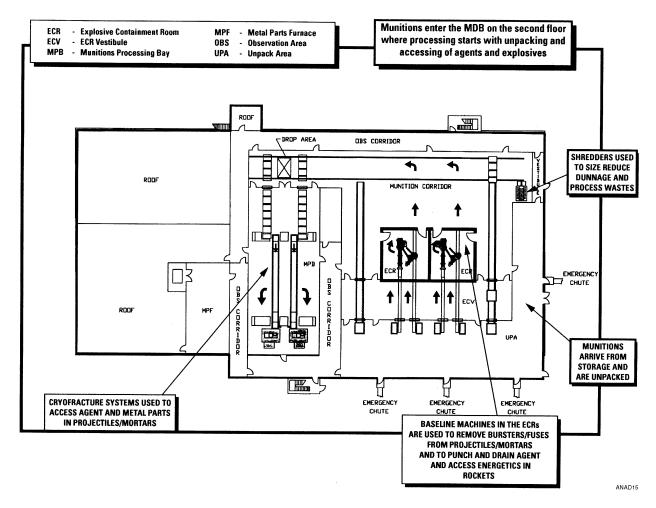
Layout of First Floor of the Munitions Demilitarization Building for the Neutralization/SCWO Facility at ANAD (Source: General Atomics 1999)
